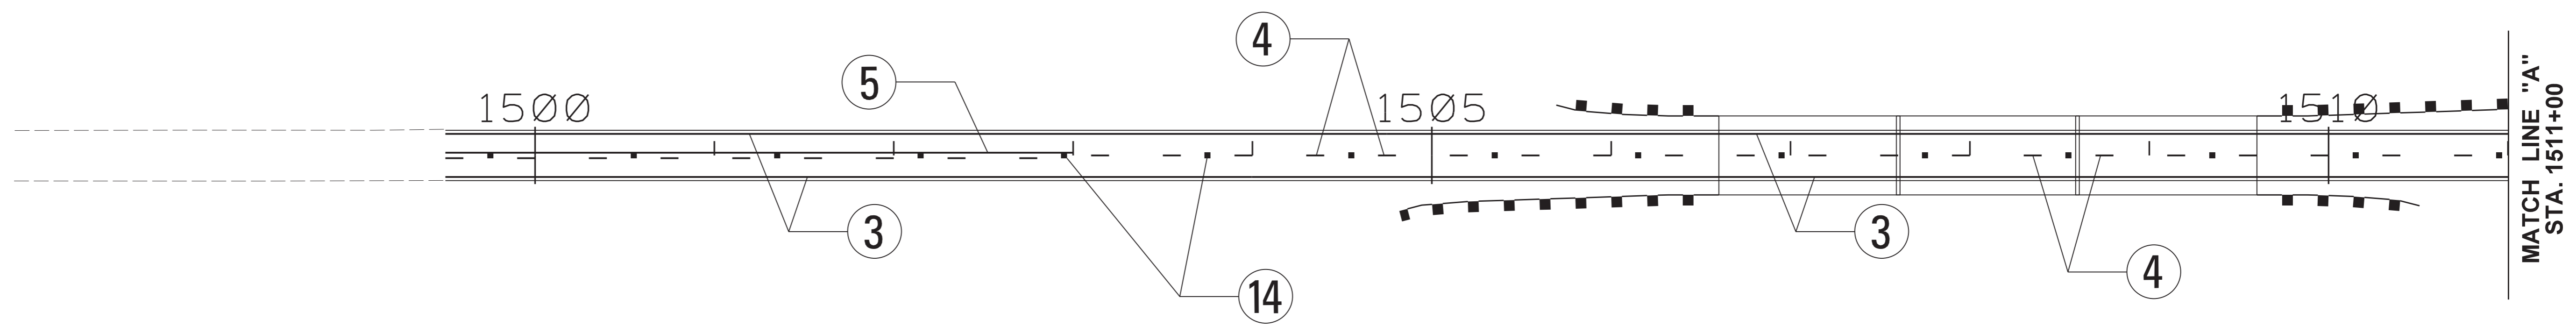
DETAIL SHOWING GUARDRAIL SECTION LAPS AND OVERLAPS
